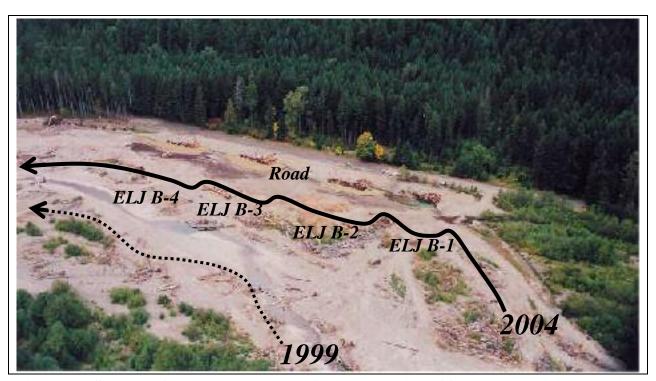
Site B on Cispus River in 1999 after construction of four ELJs and new riparian buffer along road.
